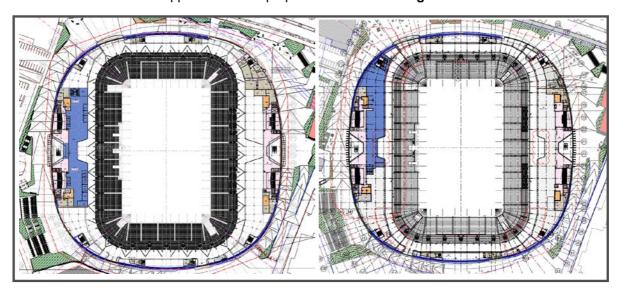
| Mezzanine level as approved (left) and proposed (right) (Source: Approved Plans (2019) and Applicant's Modification Application, 2020)
